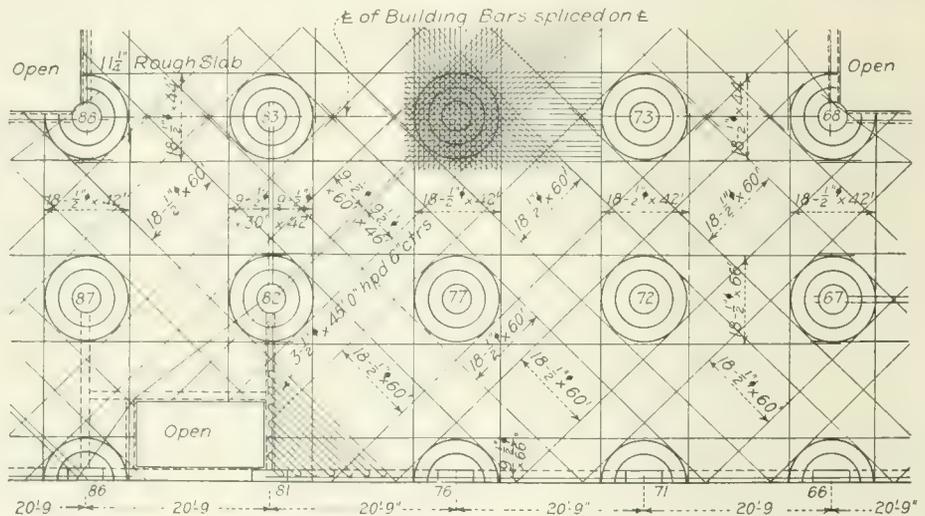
Plan of Portion of Second Floor Slab of Warm Storage Section of Warehouse, Showing Size and Arrangement of Reinforcement.
